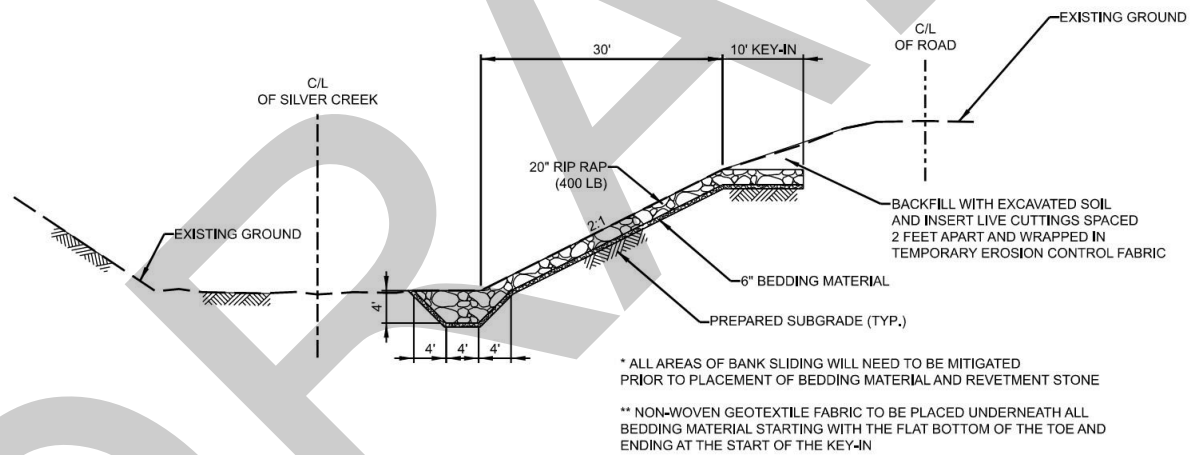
Typical plan section of Streambank revetment placement, not specific to this alternative, not to scale.
